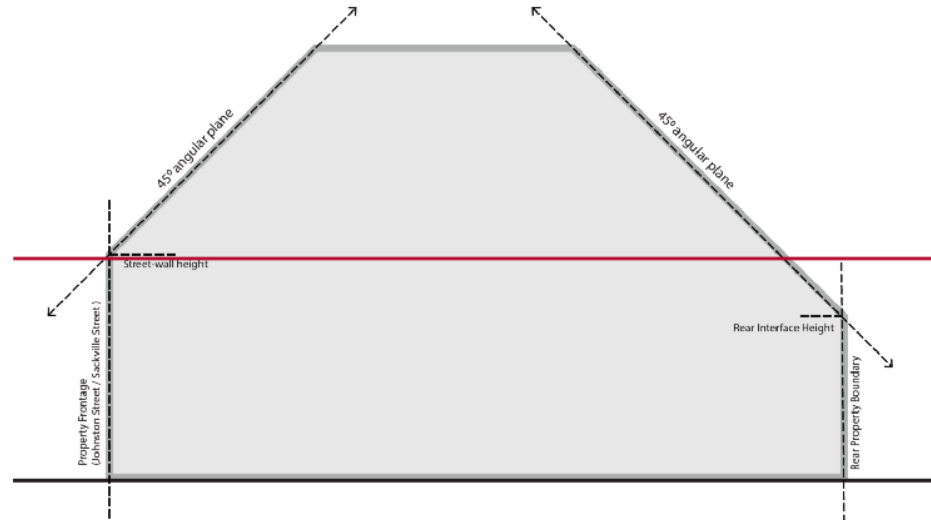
Building envelope requirement – Heritage Building ^[EK13]Figure 2: Building envelope requirement – Infill Building ^[EK14]
